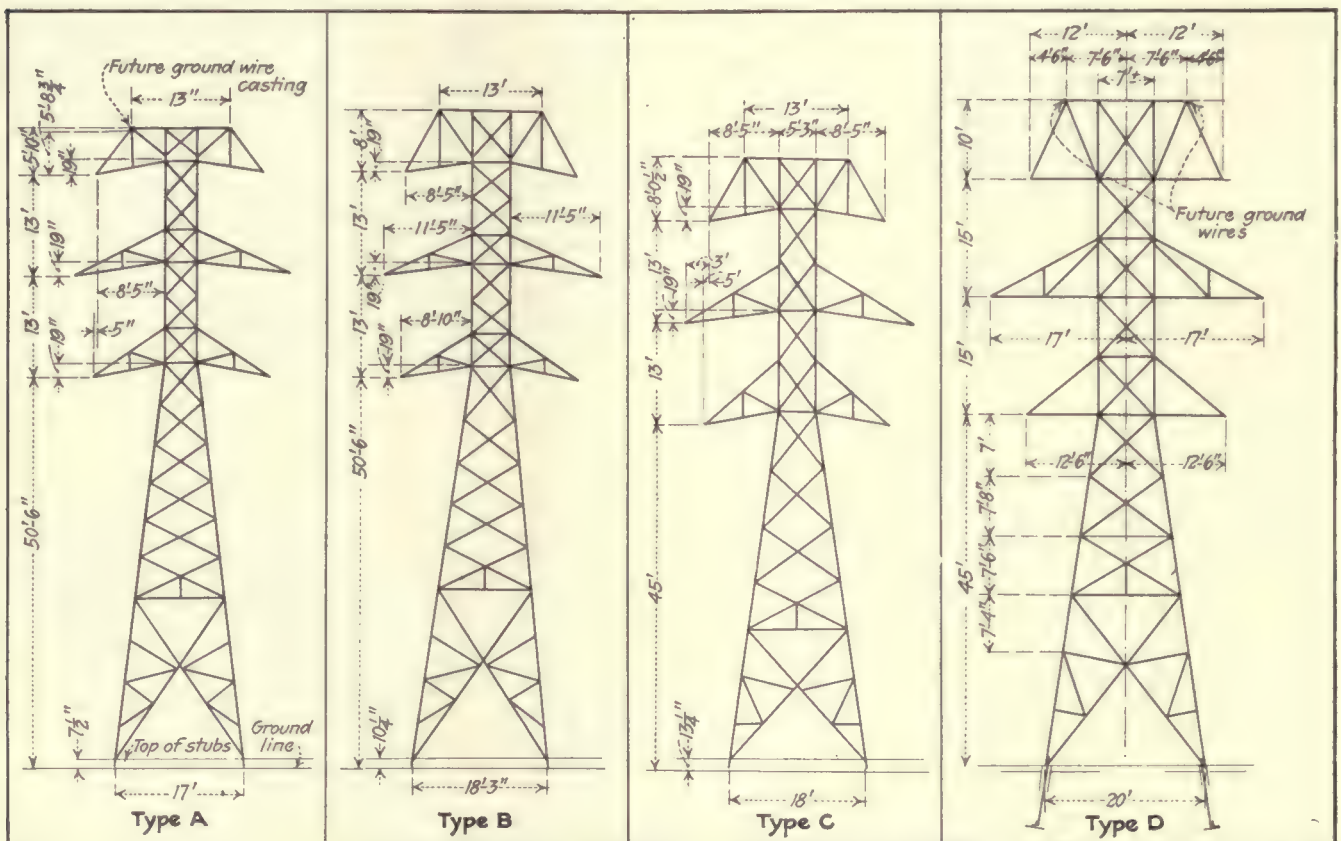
FOUR TYPES OF TOWERS AND PRINCIPAL DIMENSIONS
